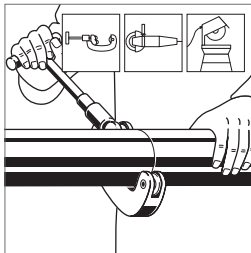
Cut the steel pipe properly and at a right angle using a pipe cutter, angle grinder or fine-toothed hacksaw. Do not use a flame cutter.
